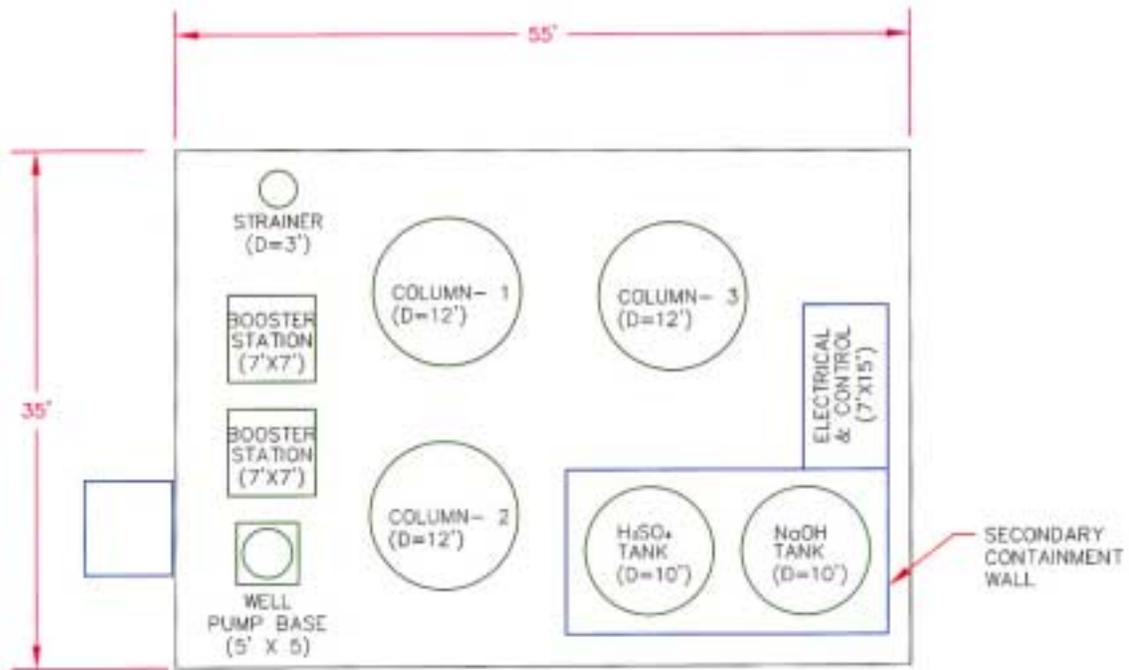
Site Layout for 1 mgd AA Treatment Plant
